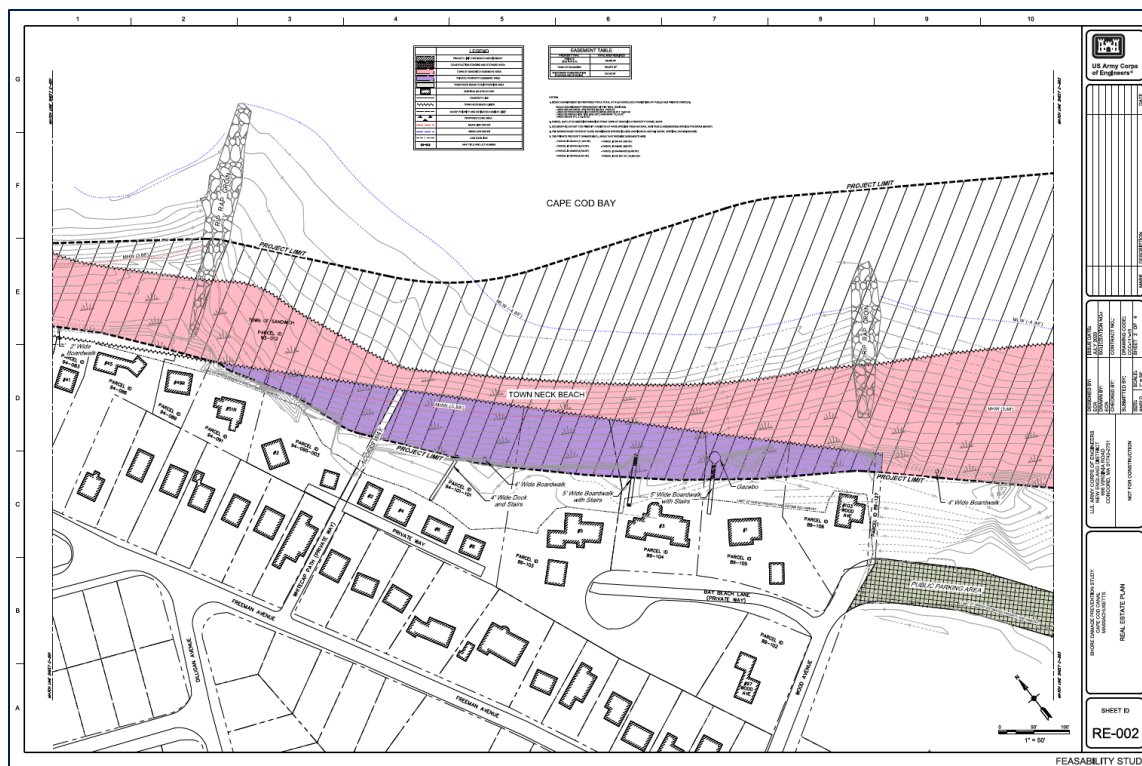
Real Estate Impacts of Recommended Plan sheet 2 of 4
